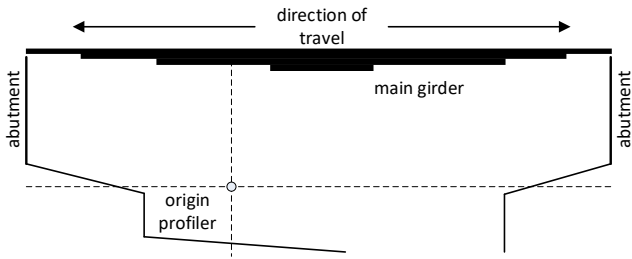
Schematic longitudinal section through the main girder of the single-tracked railway bridge.
